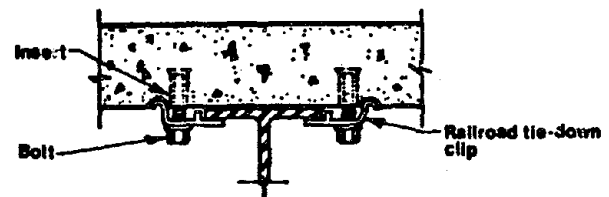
Tie-down connections used on Indiana Highway Commission experimental bridges.
